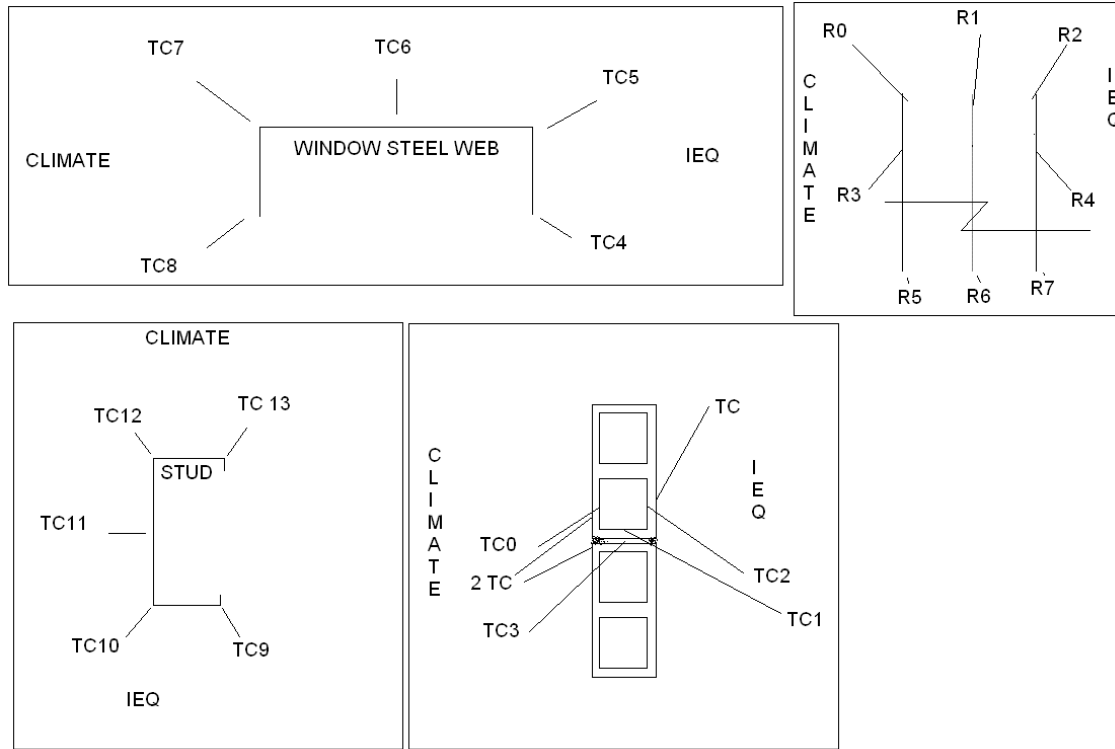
Detailed Thermocouple Locations in the Steel Frame and CMU Block Wall
